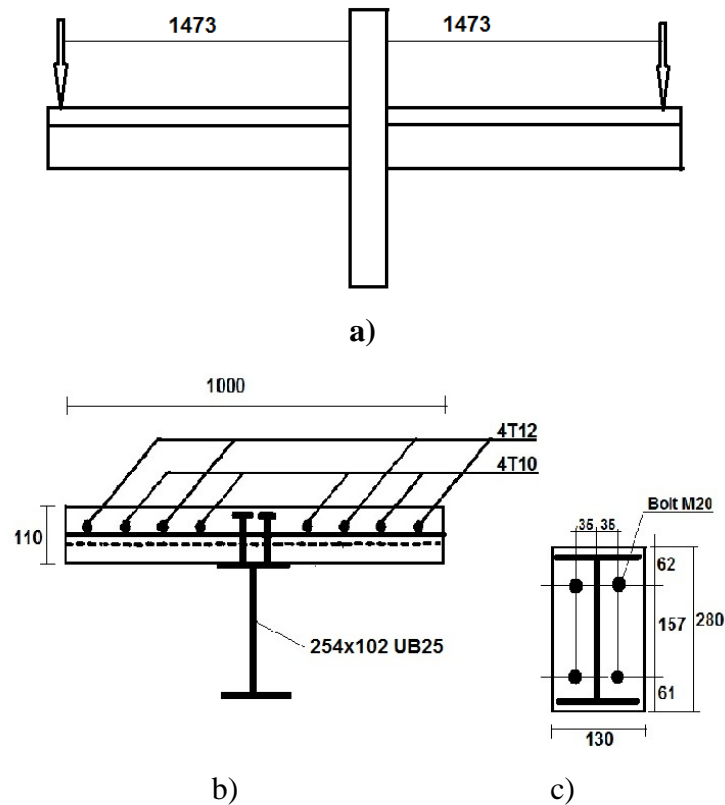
a) Load arrangement; b) composite beam section; c) end-plate
